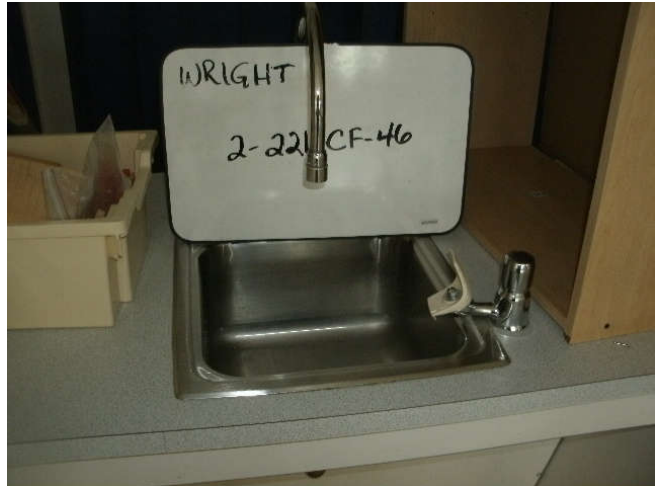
Classroom faucet w/bubbler, located on the 2nd floor, in room 221.
